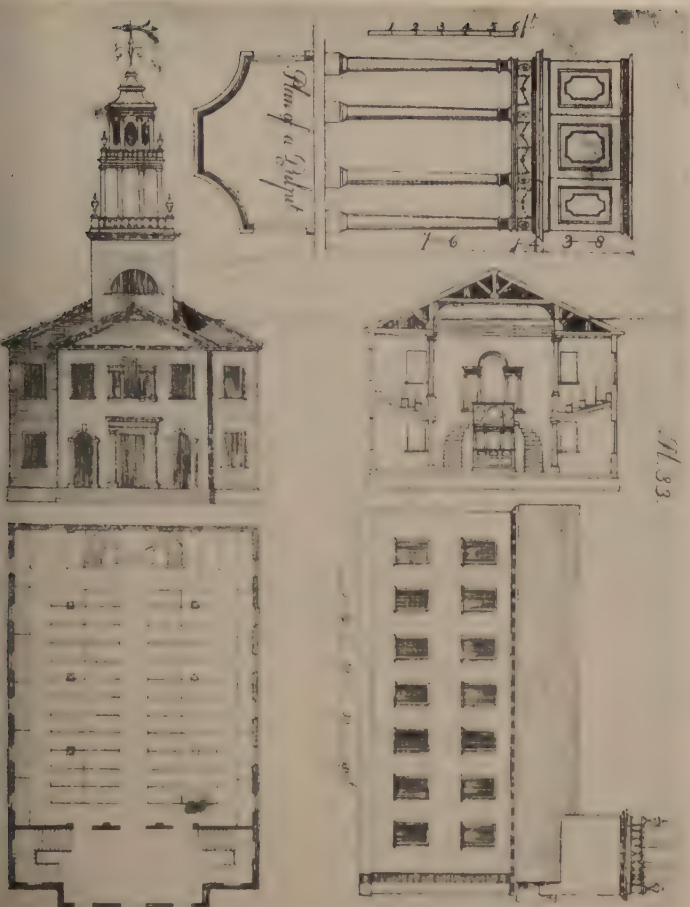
Plan, elevations and cross section of a church, Plate 33 from Asher Benjamin, *THE COUNTRY BUILDER'S ASSISTANT*.
